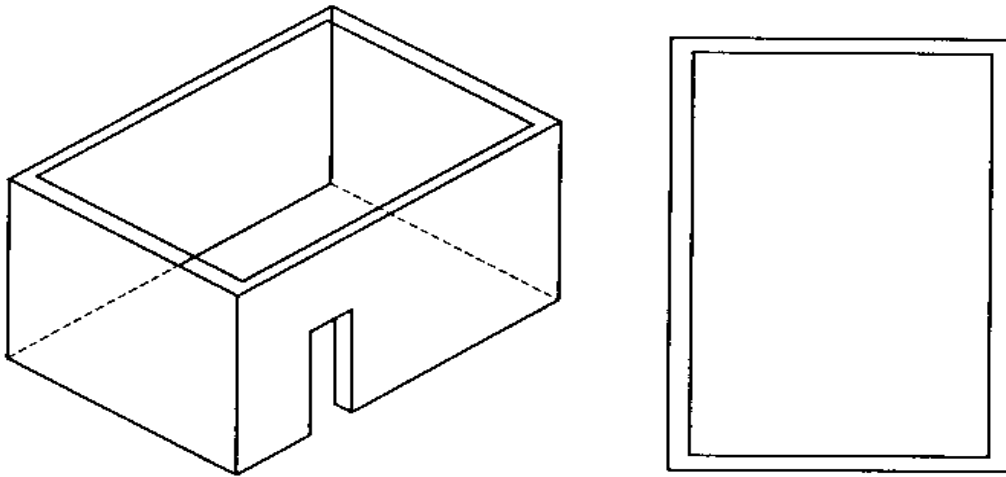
OUTDOOR AREA – EXAMPLE 2
